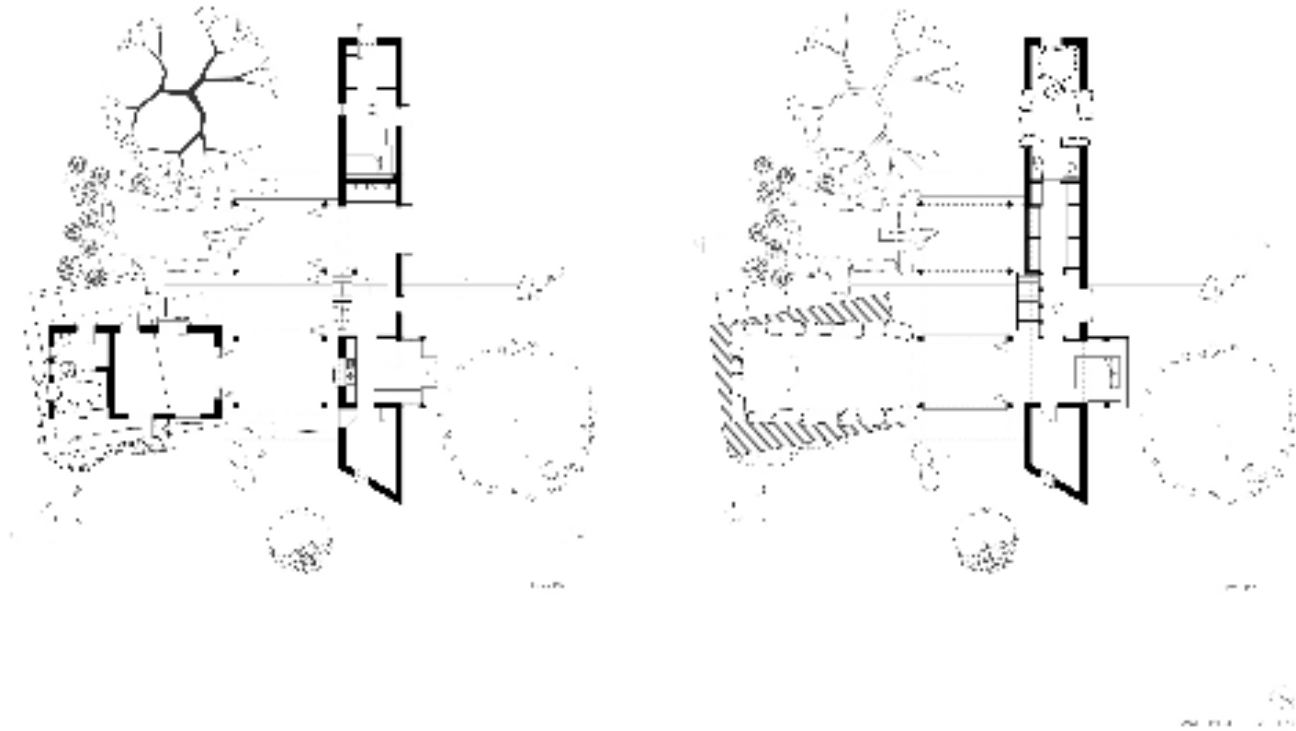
Floor Plan of the Wall House. Courtesy of architecturelive.com.
